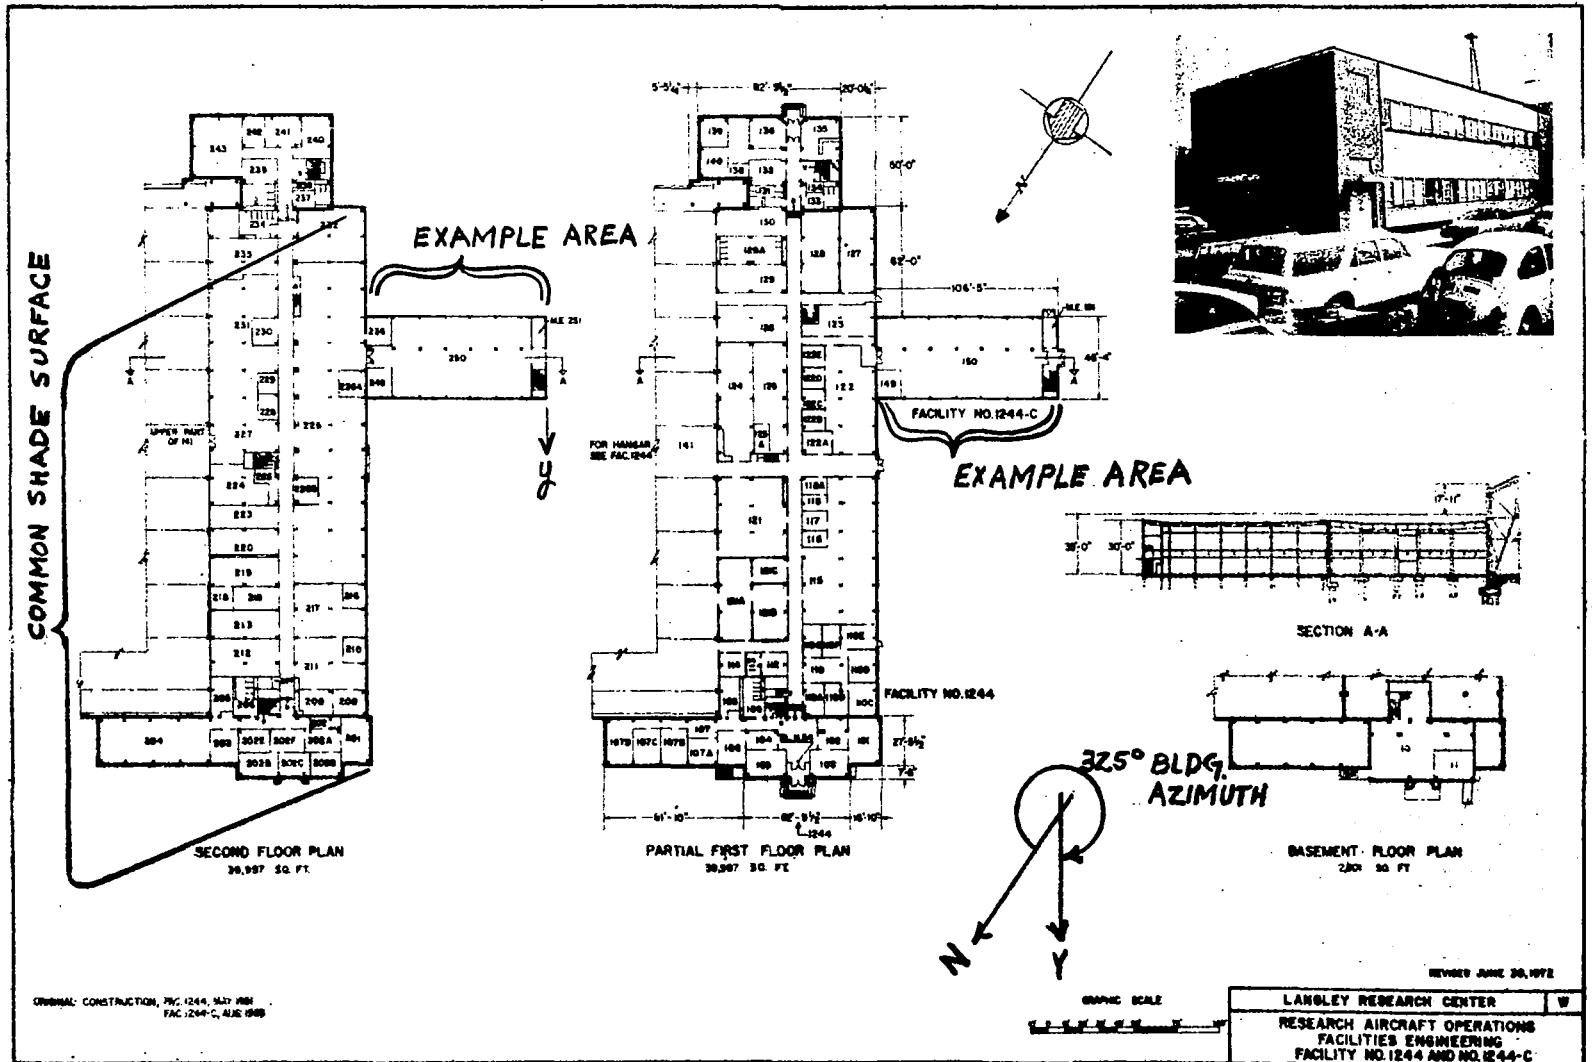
PLAN AND ELEVATION OF EXAMPLE BUILDING
